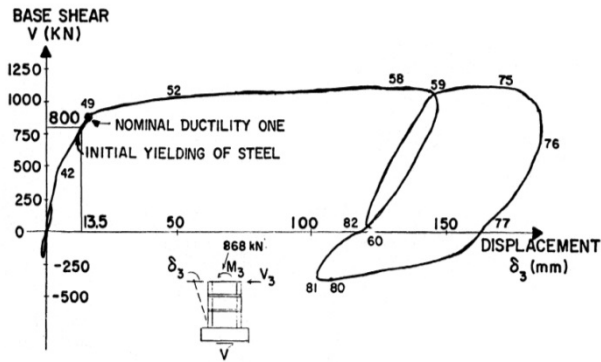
Displacement at Third Floor of Framed Wall – Monotonic Loading – Specimen 3 (Vallenas et. al. 1979)
